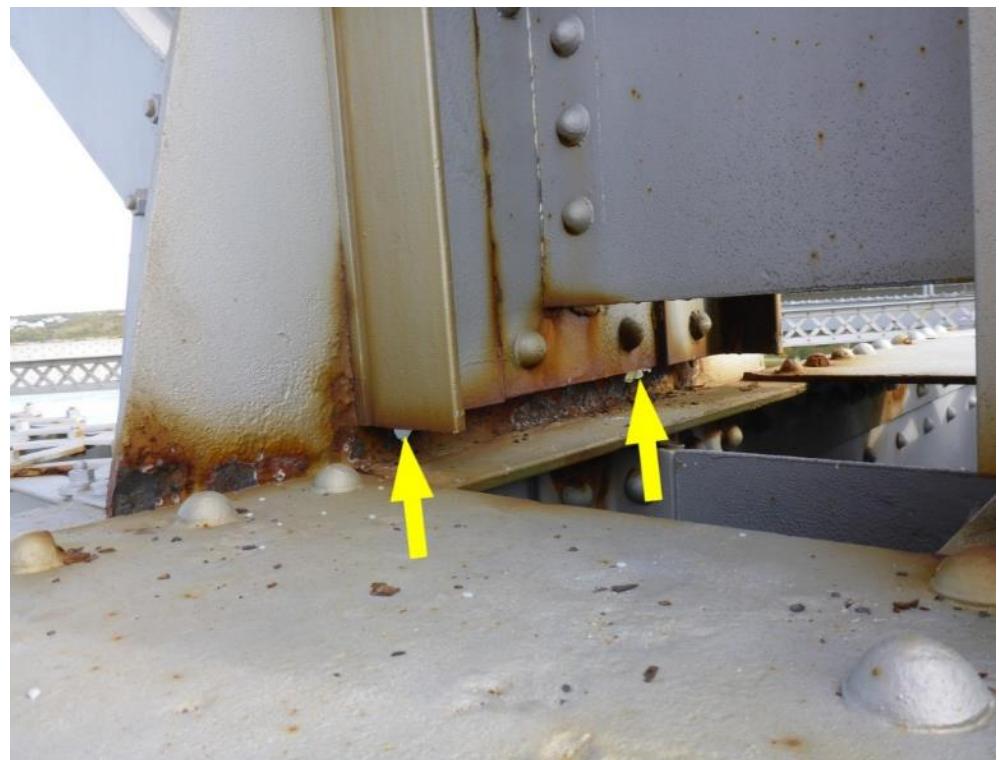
Bourne Bridge, Span 2, west truss, east gusset plate at L7' with holes along the top of the lower chord member.
